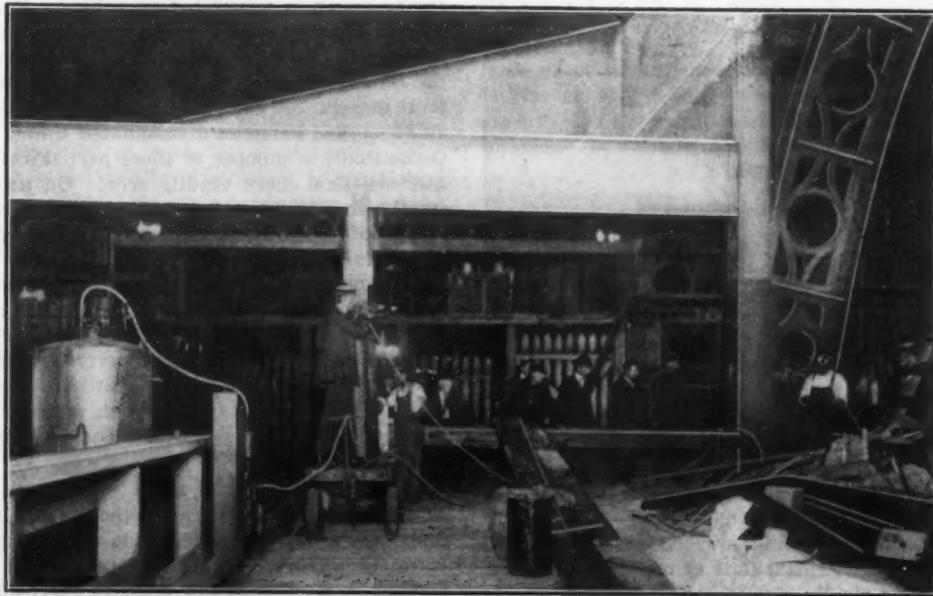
Beltzer-Delcampe Portable Oxy-Acetylene Welding and Cutting Equipment Used in Cutting Off the Steel Arches of the Old Train Shed in the Grand Central Station, New York City.
